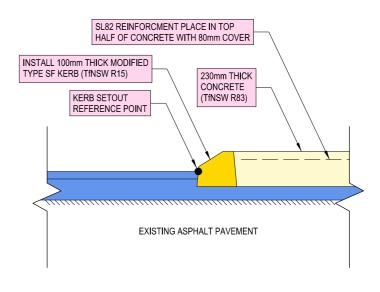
RAISED CONCRETE ISLAND (PAVEMENT TYPE 1)
